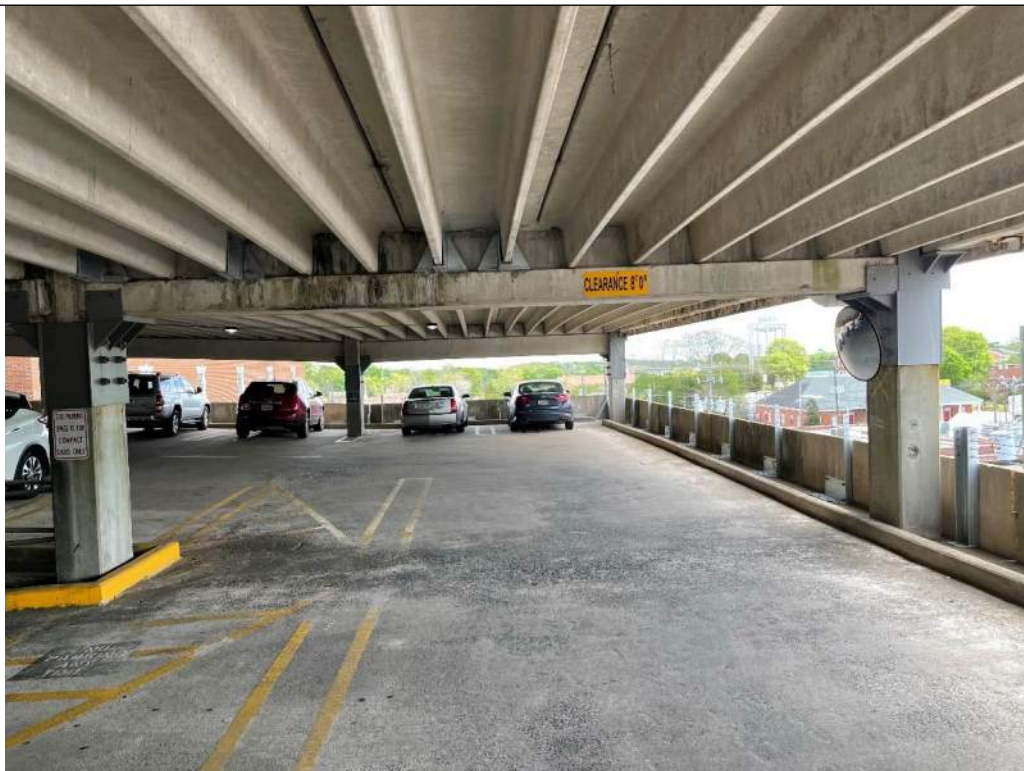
South end of Level 2A facing east toward Level 2B – note galvanized steel brackets supporting ends of double tees
